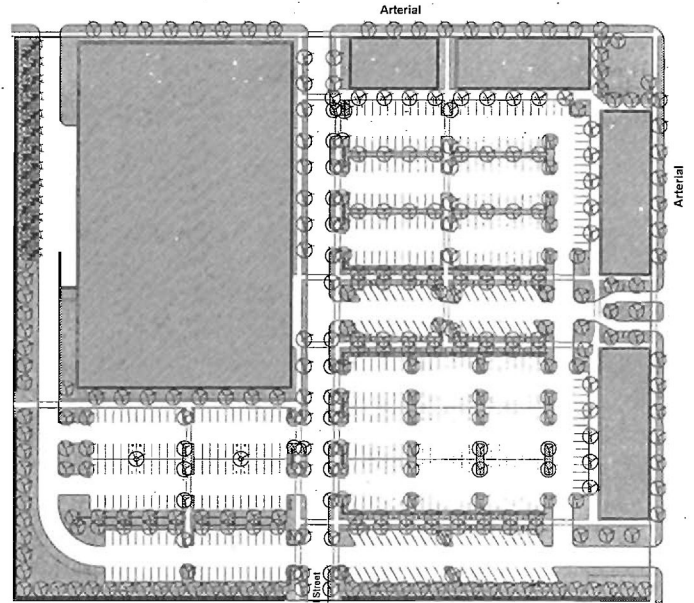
D.2: Diagram showing landscaped areas which count toward the site landscaping requirement.
